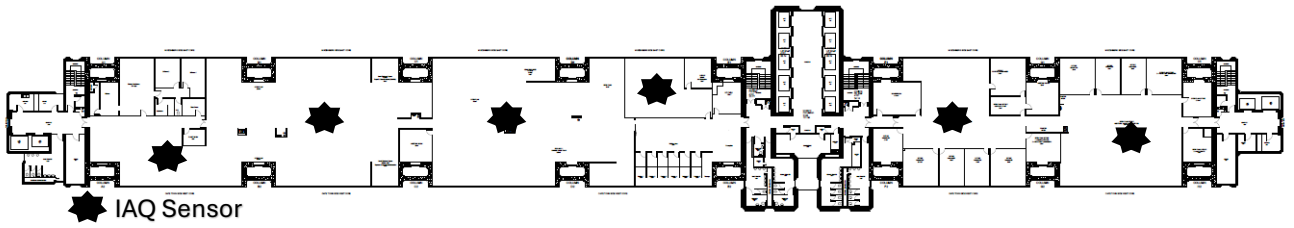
Tower Building proposed sensor positioning 6th floor (6)
